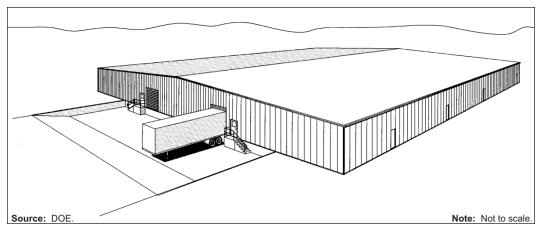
Conceptual Exterior of a New Mercury Storage Facility
